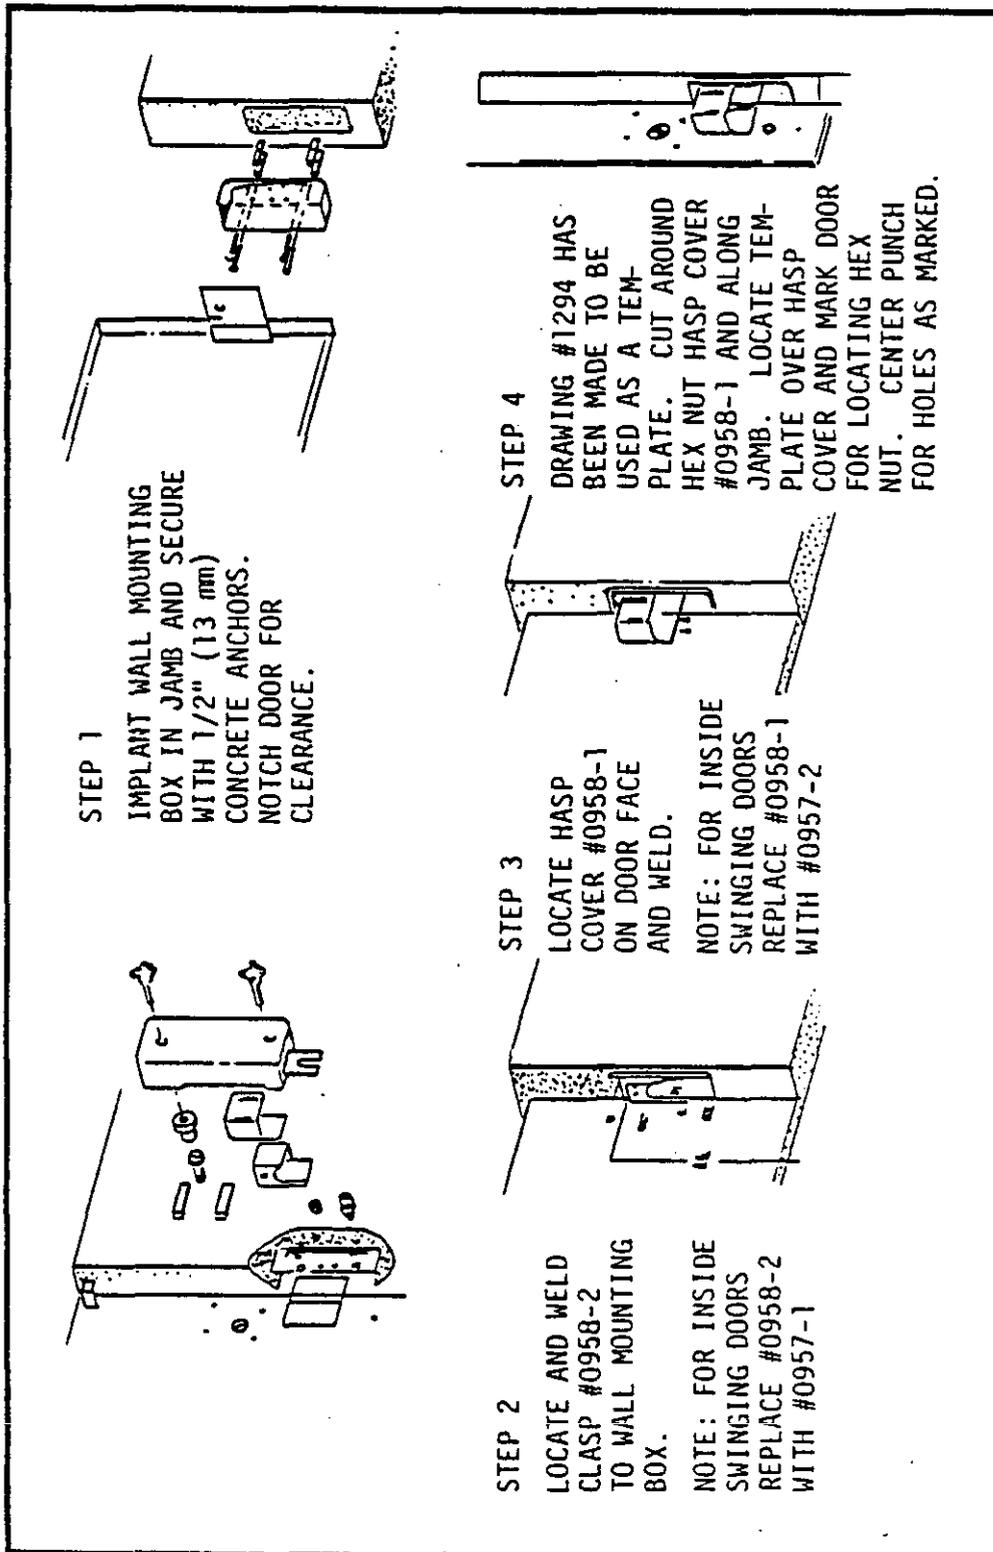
High-security hasp installation for single doors sliding right to open. (From NAPEC #1295.)
